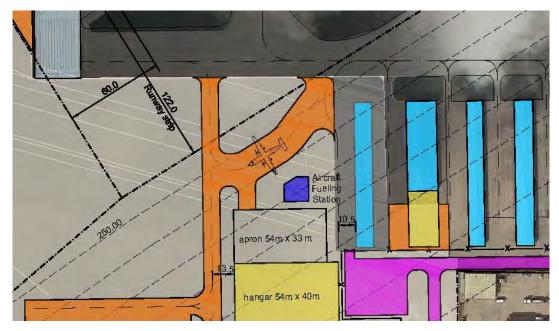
Proposed Aviation Fueling Facility Location
